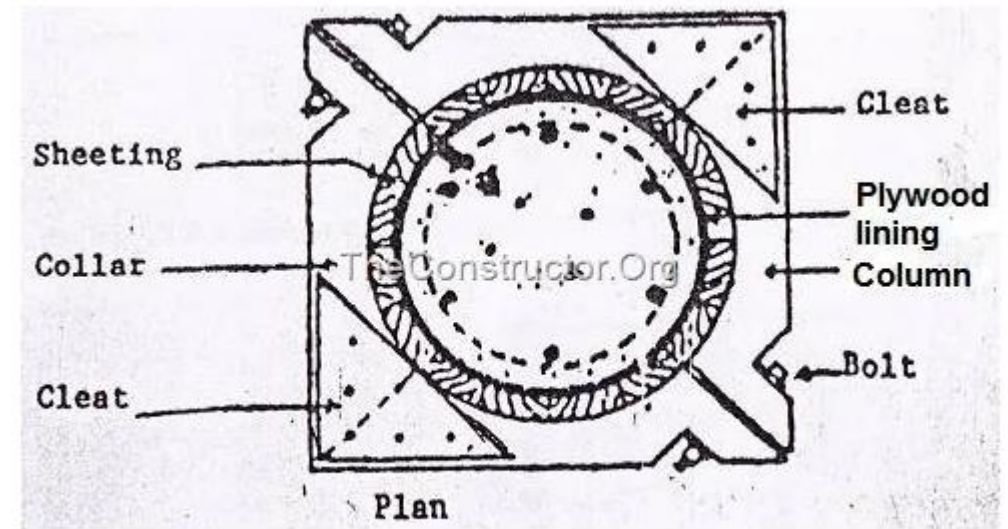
(b): Details of Timber Formwork for Circular RCC Column
